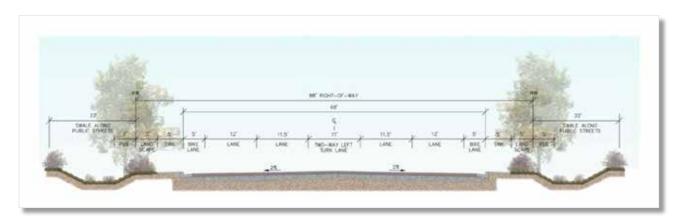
Proposed Harris Road, Northwest of Harris Place (no parking allowed)
